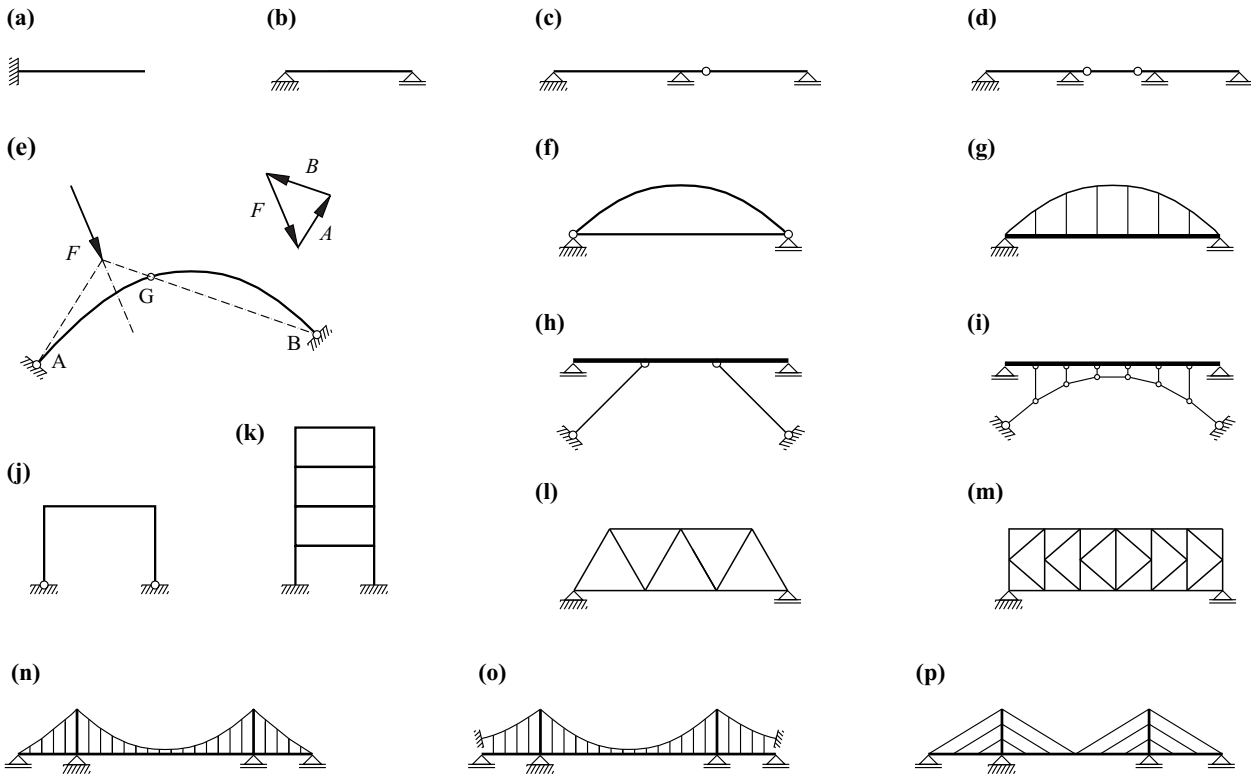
Examples of plane framed structures: (a) cantilever beam, (b) simply supported beam, (c) hinged girder, (d) hinged girder with suspended beam, (e) three-hinged arch, (f) two-hinged arch with tie, (g) LANGER beam, (h) strutted beam, (i) deck-stiffened polygonal arch, (j) two-hinged frame, (k) multi-storey frame, (l) WARREN truss (m) K-truss, (n) self-anchored suspension bridge, (o) externally anchored suspension bridge, (p) cable-stayed bridge
